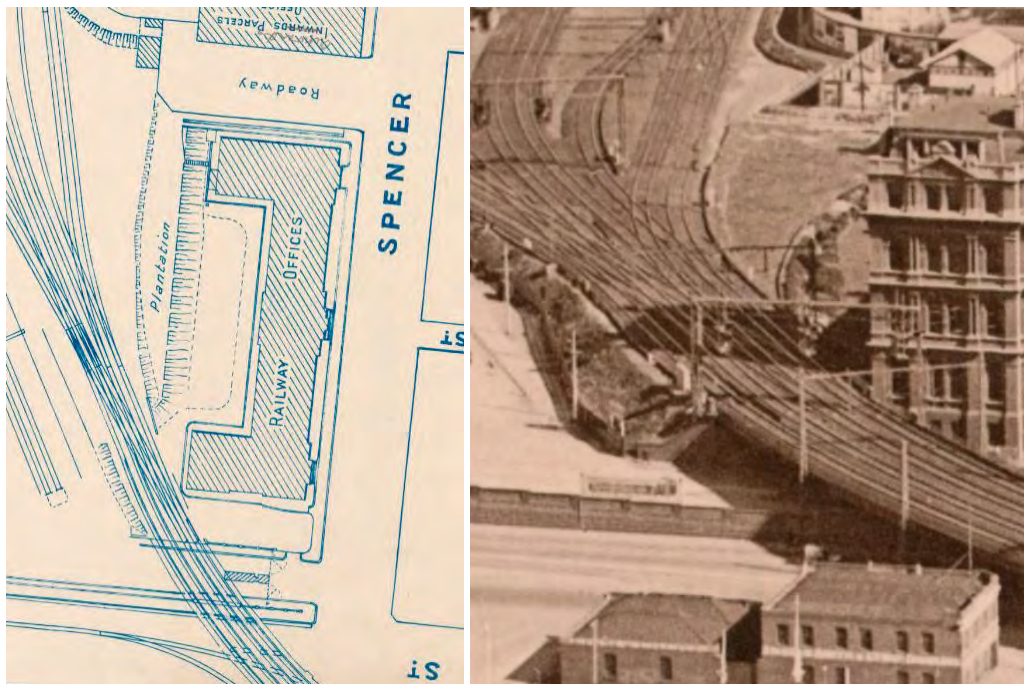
An extract of 1920 plan of the Spencer Street Station Yards (left-hand side) and an extract of 1927 photograph of same section, showing the raised terrain with plantation at the rear of the former Railway Administration Building. (Source: Victorian Railways 1920, SLV; Airspy c1927, SLV)
